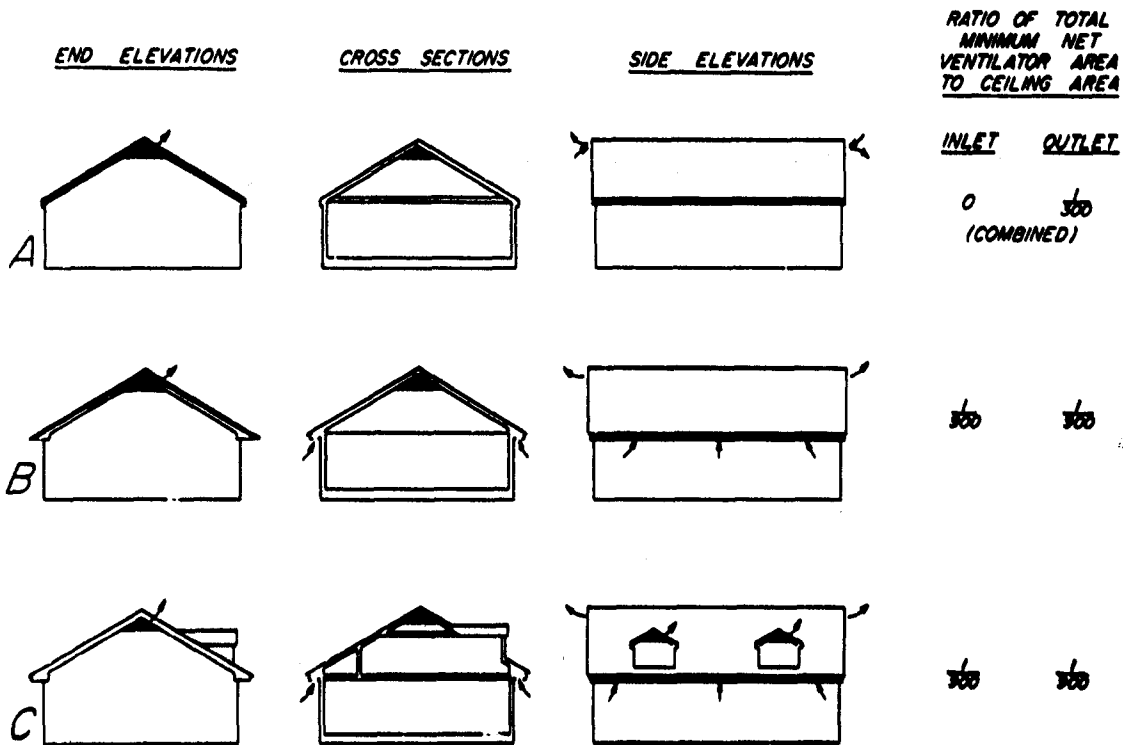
Ventilating areas of gable roofs: A, Louvers in end walls; B, louvers in end walls with additional openings at eaves; C, louvers at end walls with additional openings at eaves and dormers. Cross section of C shows free opening for air movement between roof boards and ceiling insulation of attic room. M 87625 F
